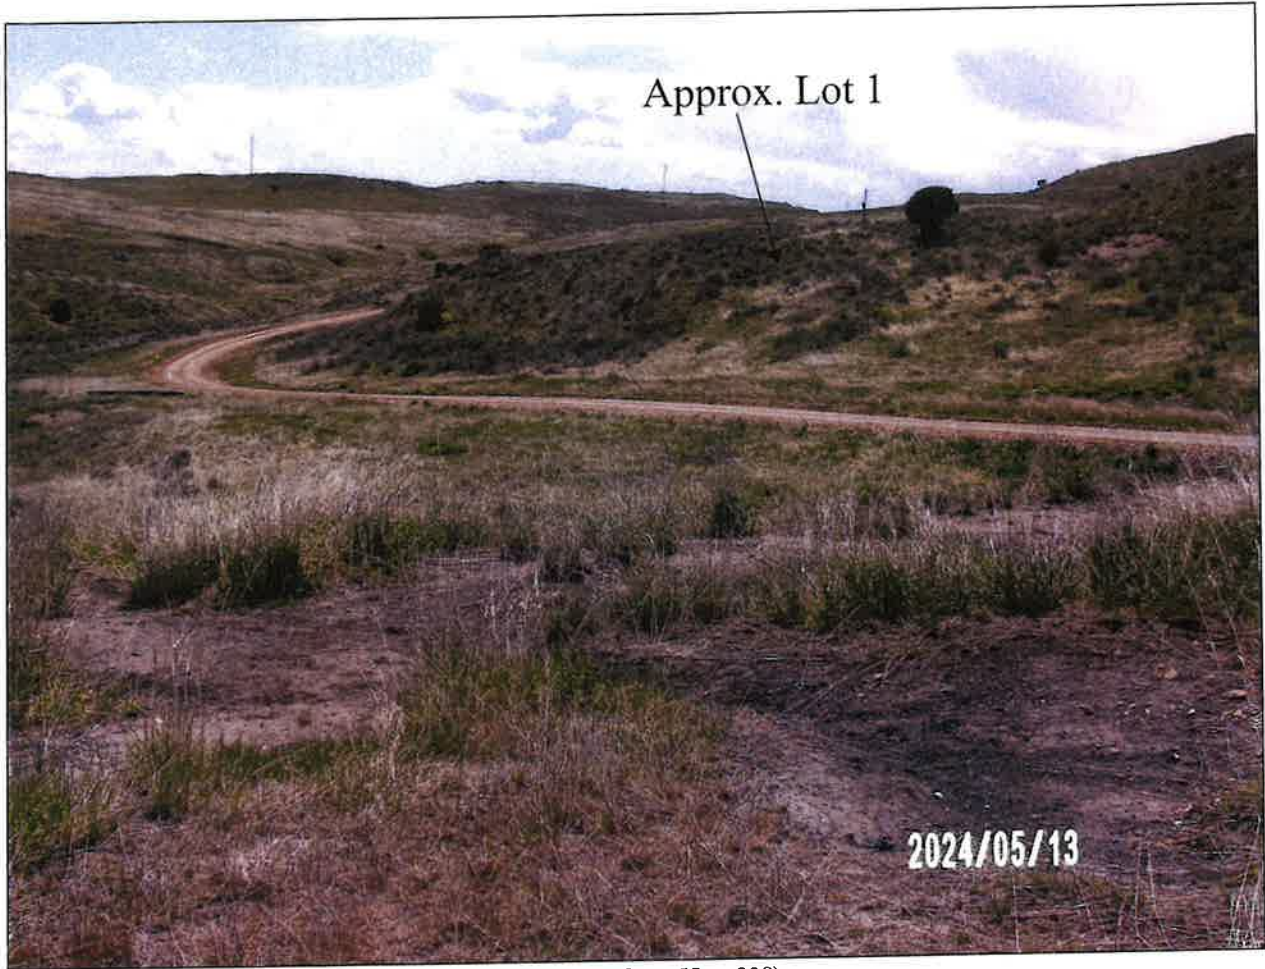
Portion of constructed Bree Lynn Rd, (looking south from Hwy 338)
